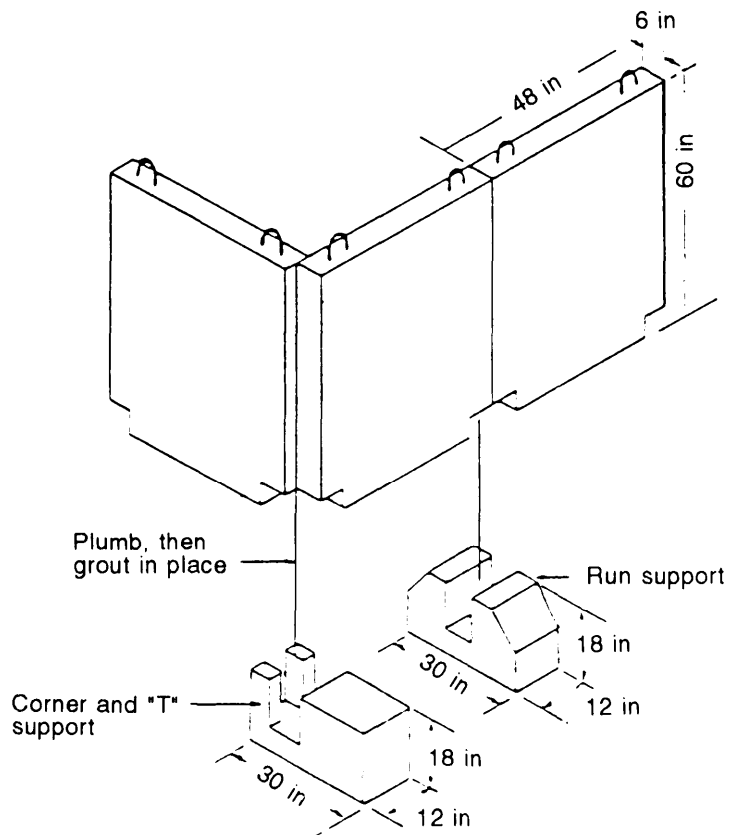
Movable, precast, concrete revetment with movable 4- to 9.5-foot sections
